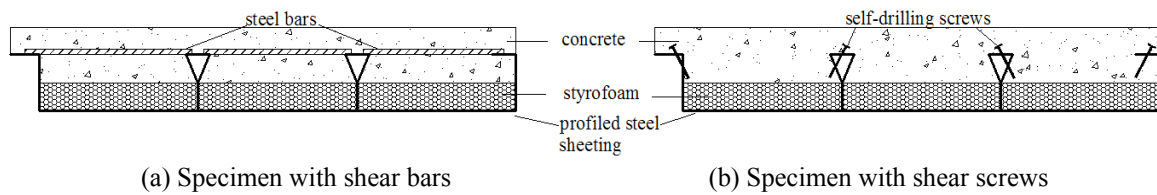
Cross-section view of the internal structure of a composite sandwich slab
